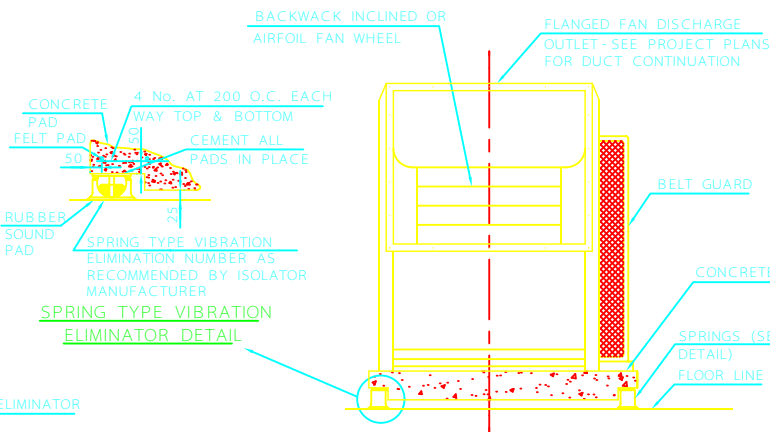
DETAILS OF FAN INSTALLED IN SHEET METAL HOUSING
